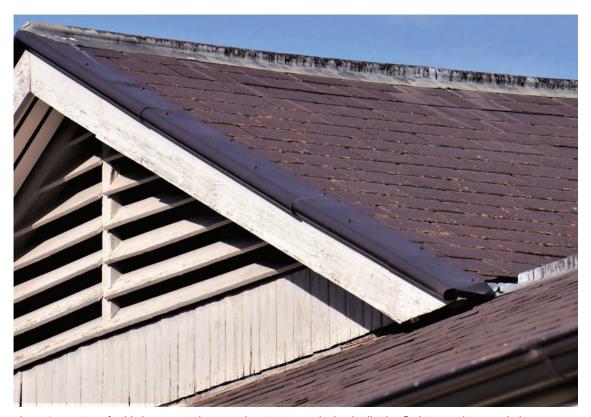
View of gable louvres on the west elevation. Note the lead roll ridge flashings and newer, dark grey painted galvanised steel barge flashing. The woodwork to the louvre panel and barge boards badly needs painting. The vertical timber cladding boards need to be renewed, and the rusting galvanised flashing to the base of the cladding should be replaced at the same time.
